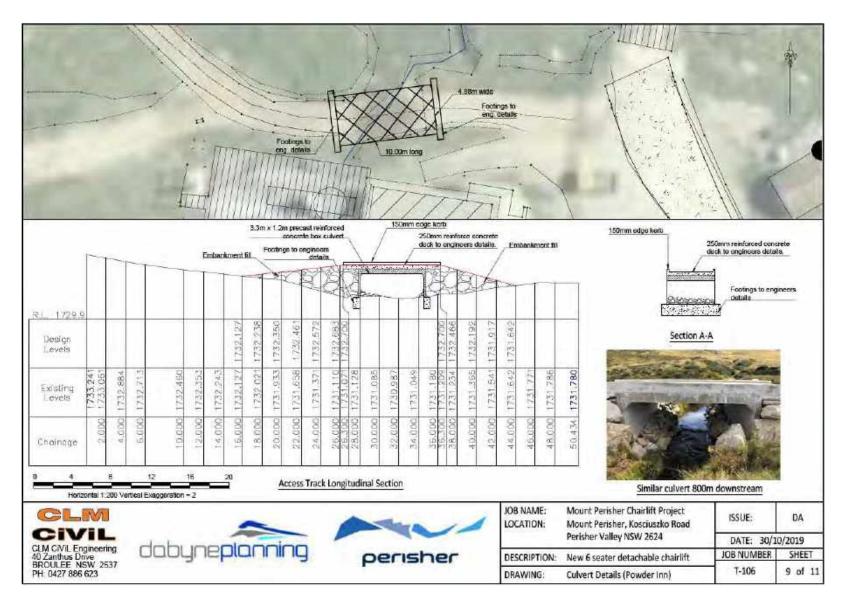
The proposed culvert where the existing access road crosses Perisher Creek.
